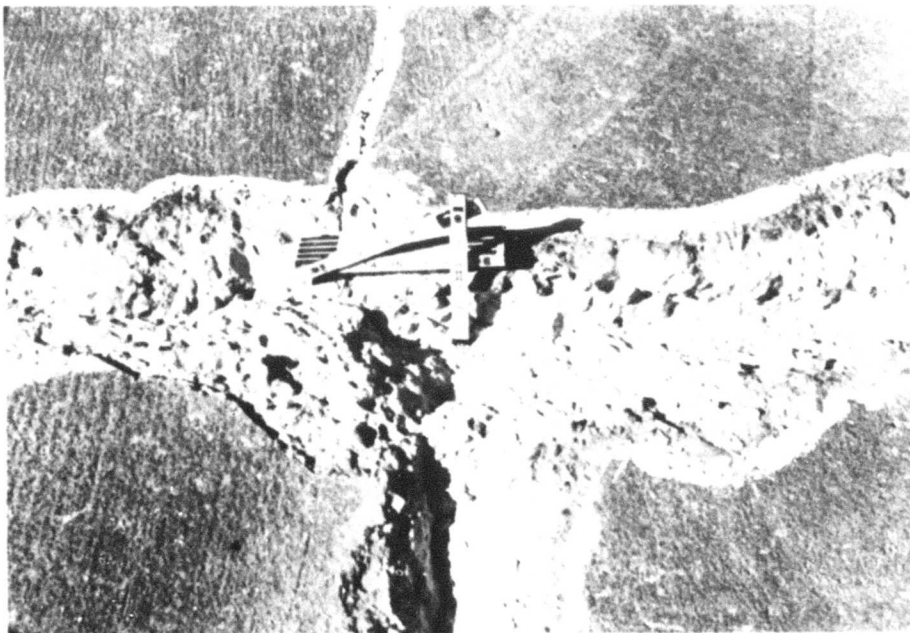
Close up of a Spalled Crack in 10-in. Thick Plain Concrete Item Shown Above in Figure 5
